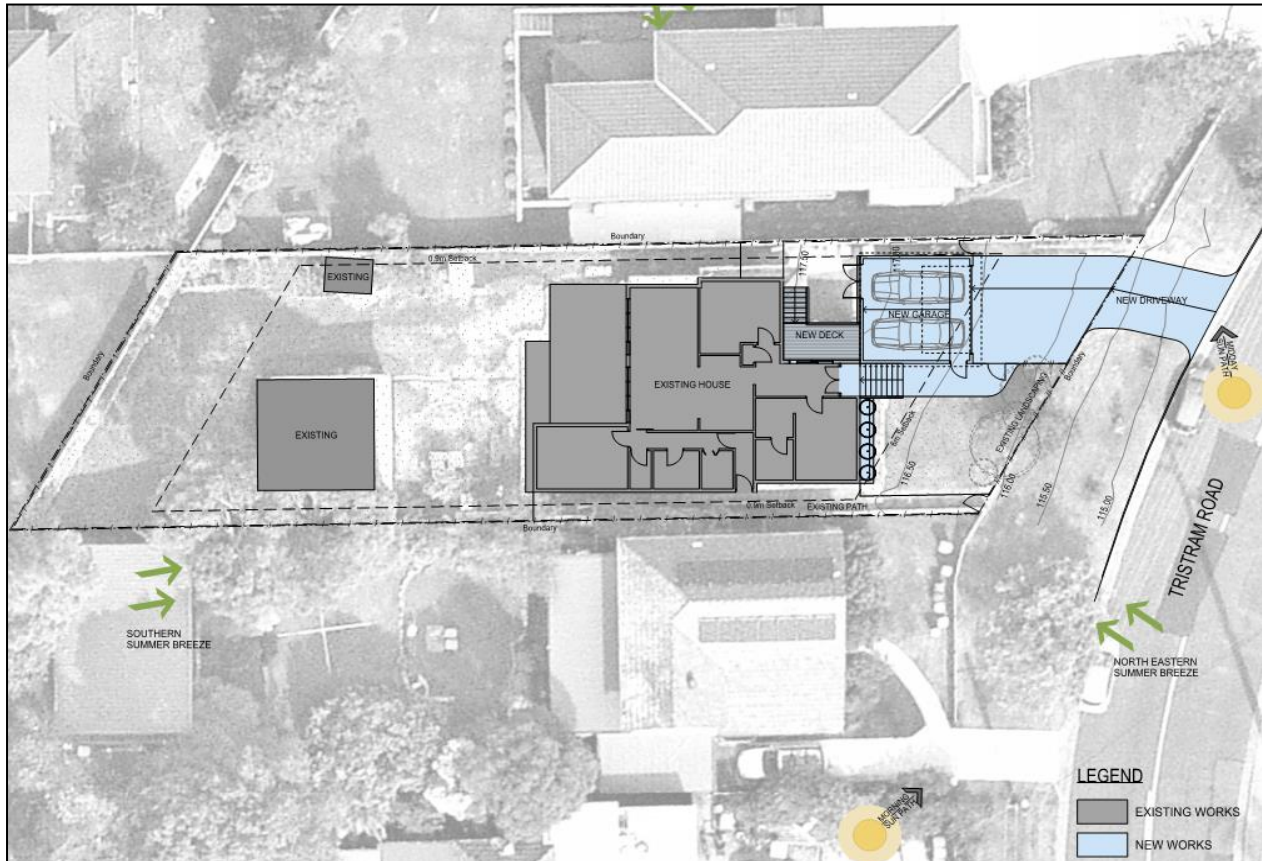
Proposed Site Layout (Source: Paul Salvarinas, 2019)
